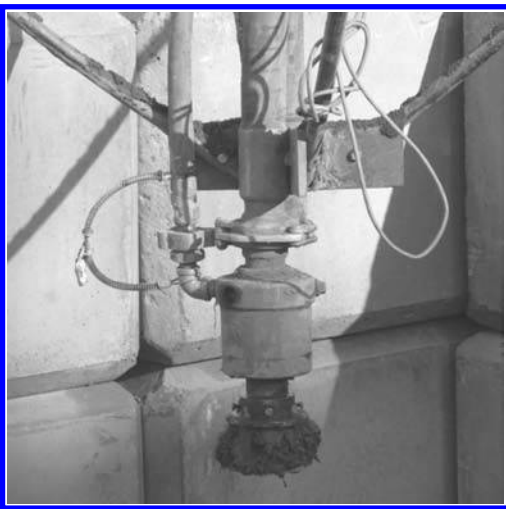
Spinner head assembly connected to pump hose and compressed air line.
